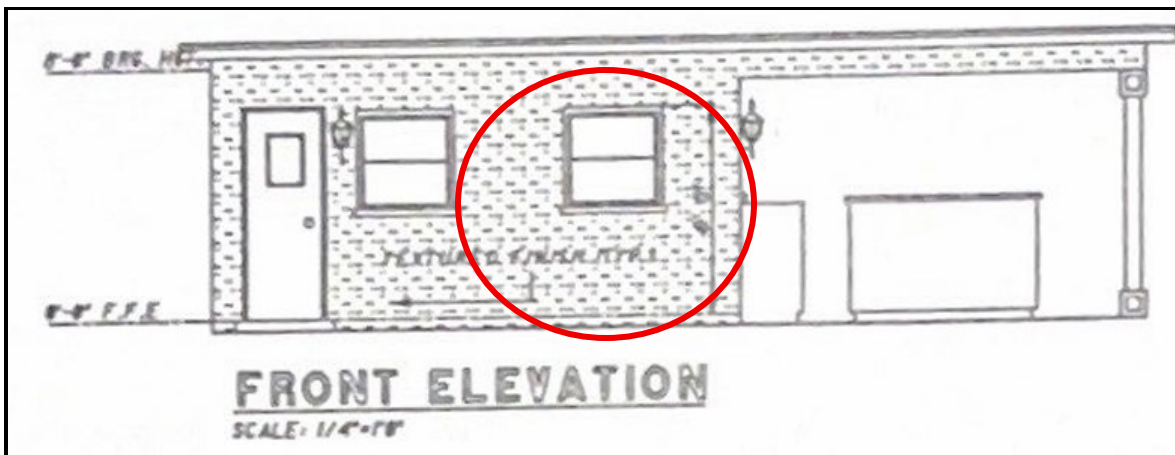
Building Elevation, Building Permit 2302130 (December 2023)
